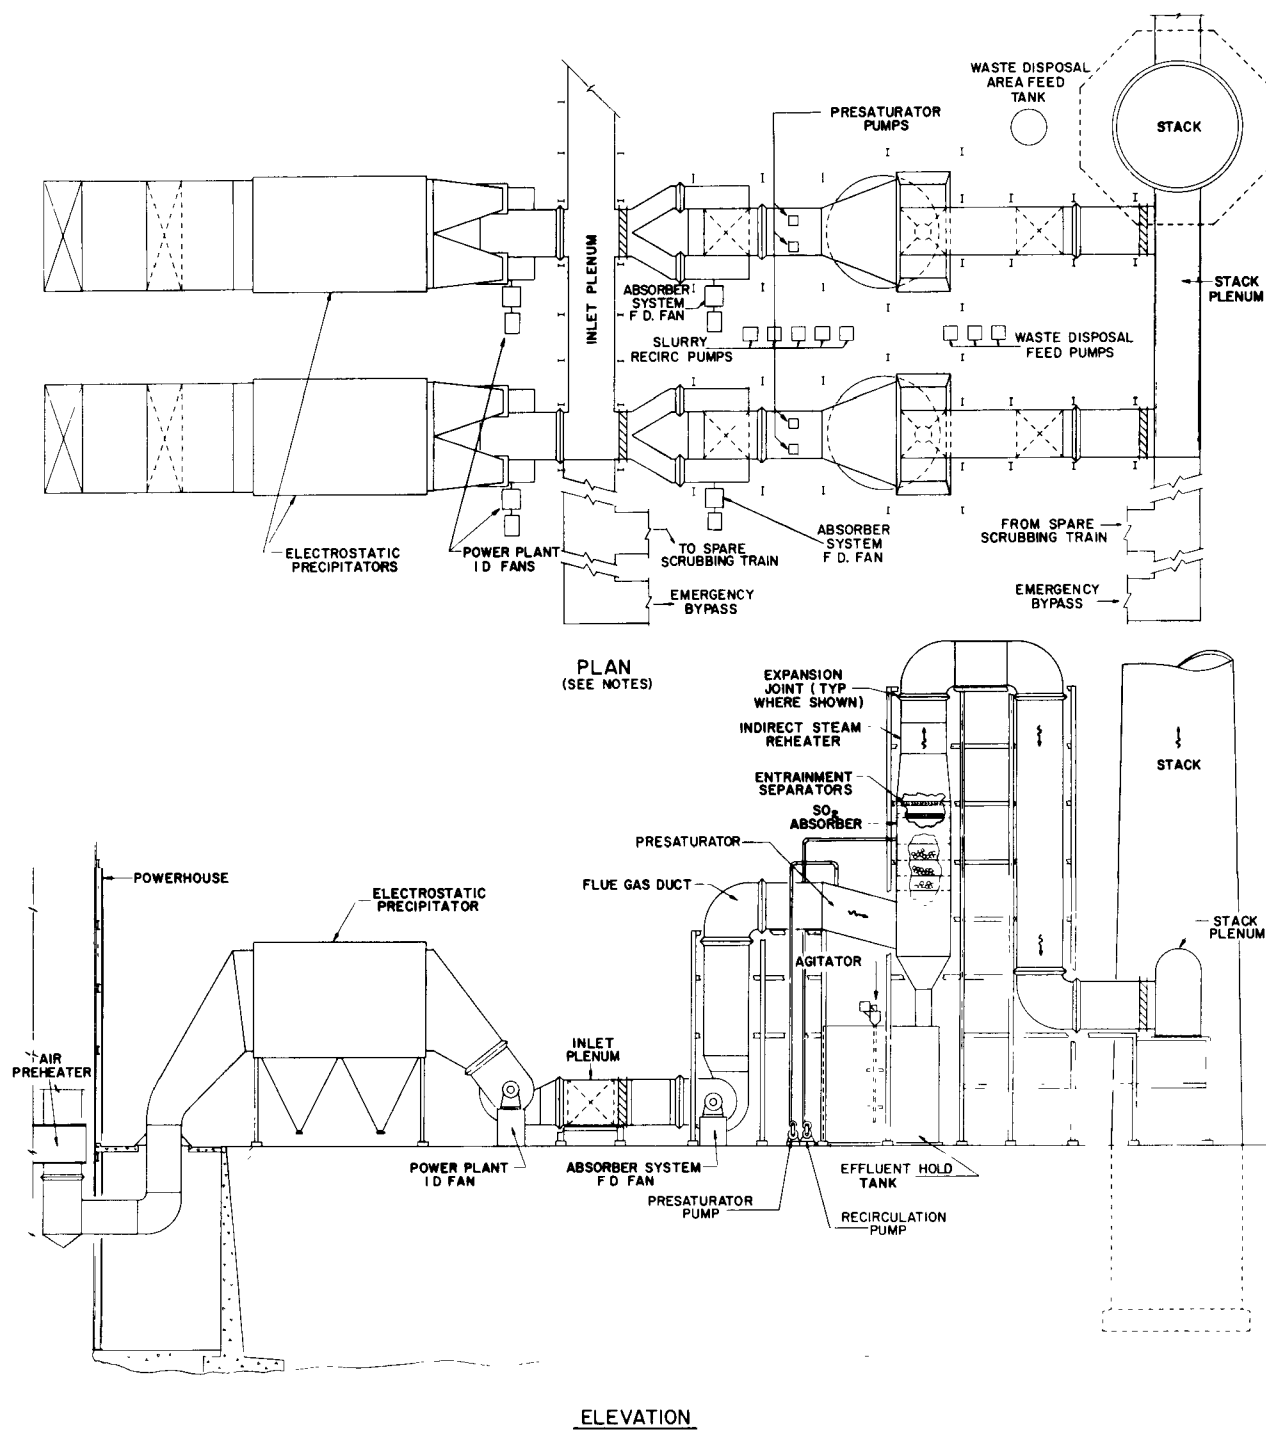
Plan and elevation for TCA utilizing forced-draft fans.
